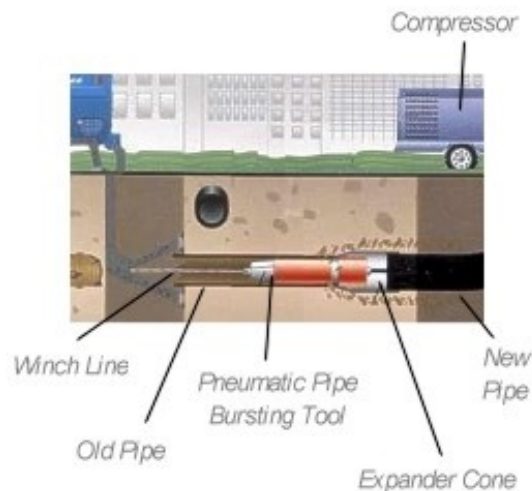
Pneumatic Pipe Bursting (www.tttechnologies.com)
